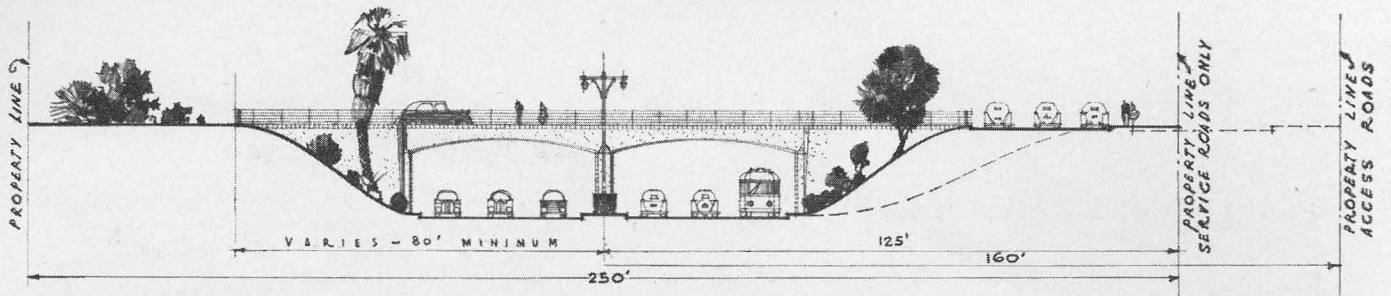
FOOTBRIDGE CROSSING PARKWAY
